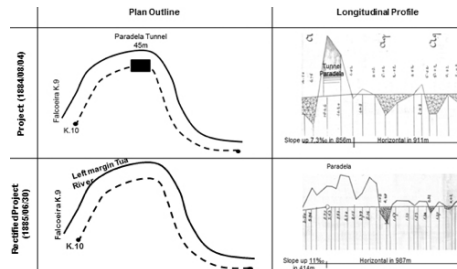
Plan outline and the longitudinal profile for railway between Foz Tua and Mirandela in Bad Boulders (Fragas Más) for the project and rectified project (adapted REFER archives)
